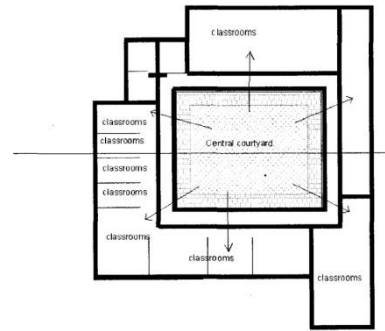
Plan of medium scale building where jalis used around corridor area.
